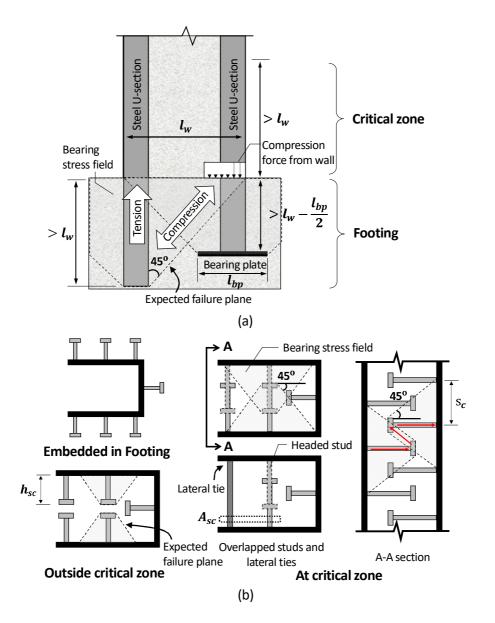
Recommended details of (a) anchorage; and (b) steel anchors of steel U-sections.
